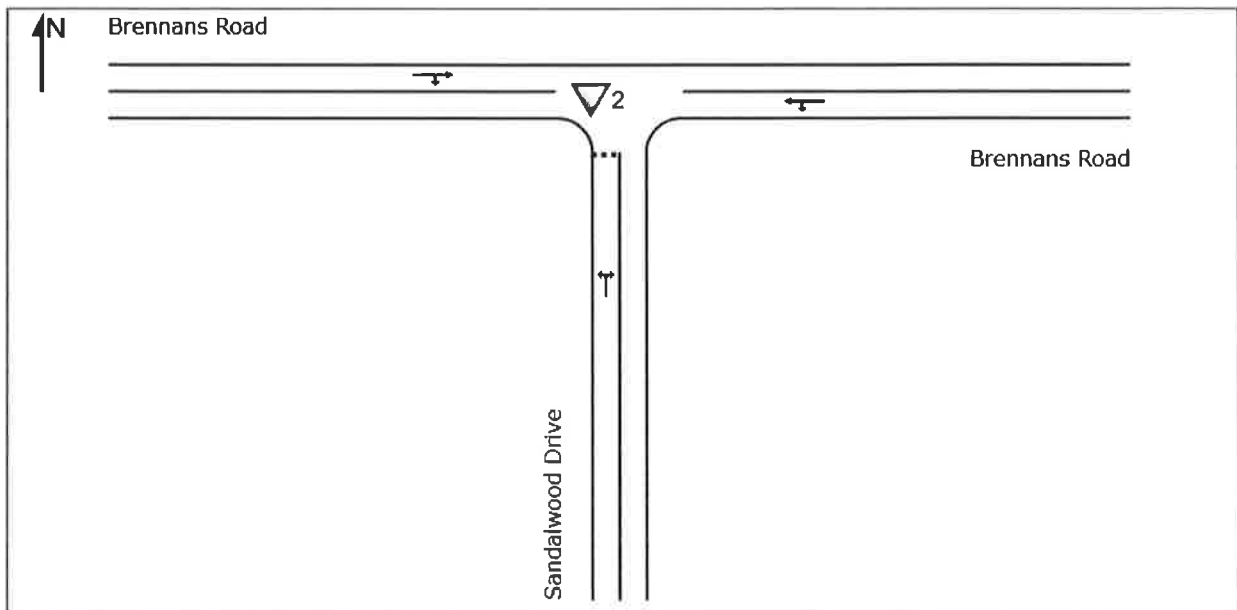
Brennans Road / Sandalwood Drive Intersection Layout
